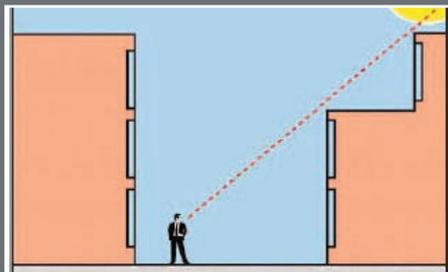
Use of upper floor setback to maintain light to public and private realm
